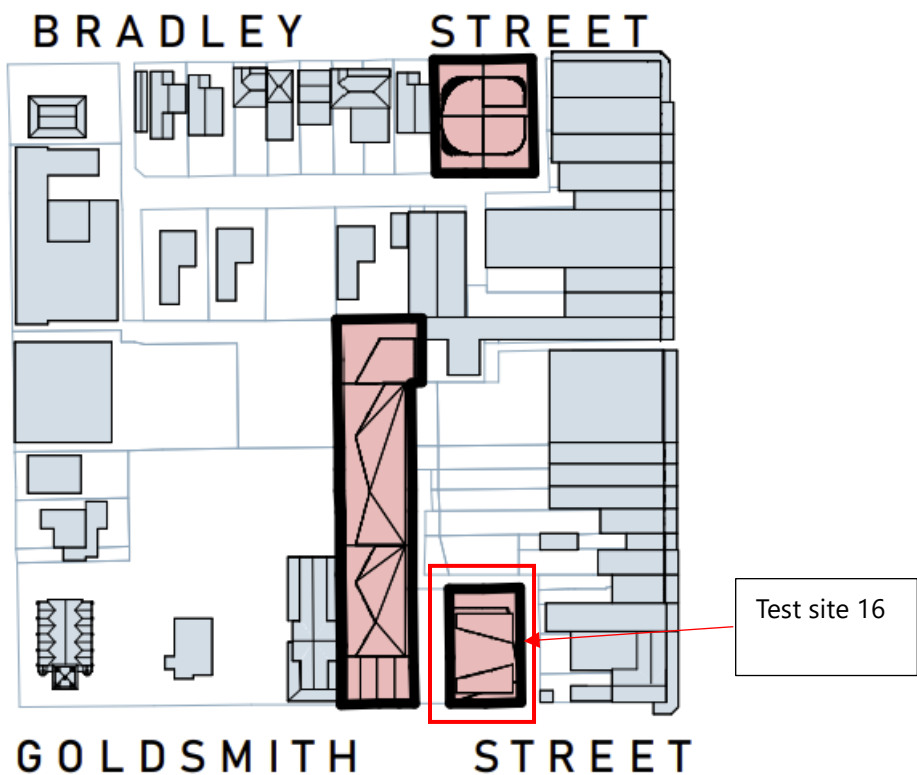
Image Tim Lee Architects planning model. The existing residential property and an adjacent ruin with shed to the north, the lots are surrounded by access lanes and Goldsmith Street.
